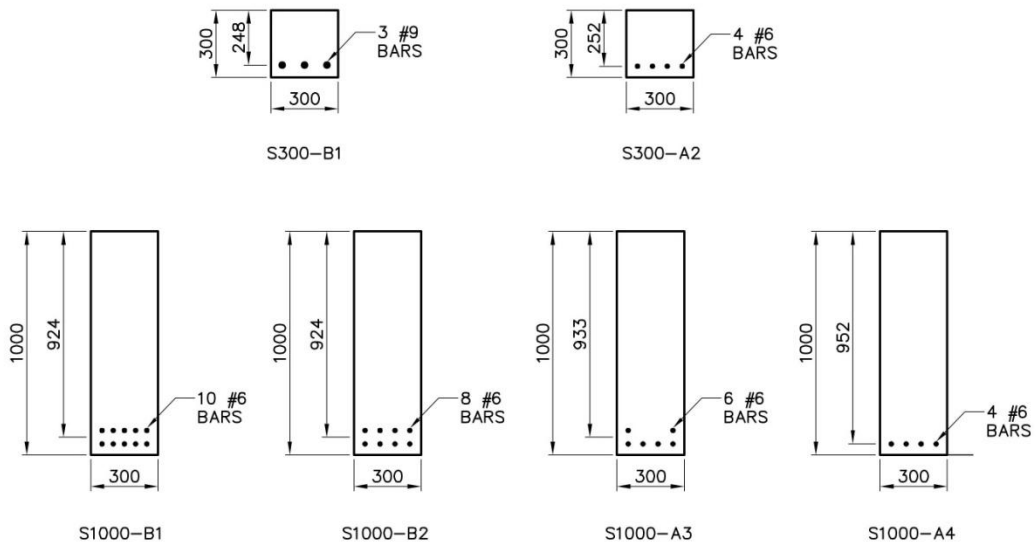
Large Scale Structural Specimen Cross-Sections
